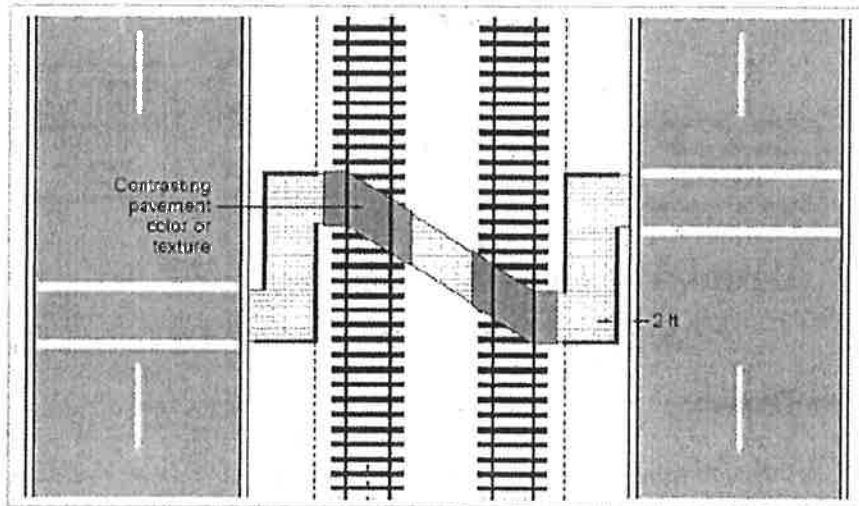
C-10 Examples of Pedestrian Barrier Installation at an Offset Non-Intersection Grade Crossing, CAMUTCD.
